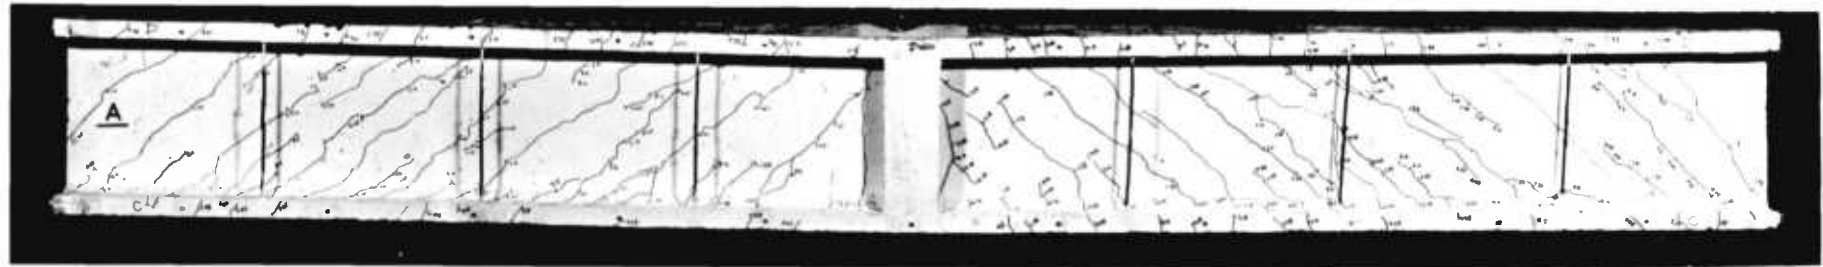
Crack Development on I-Section with Double Stirrup Reinforcement
